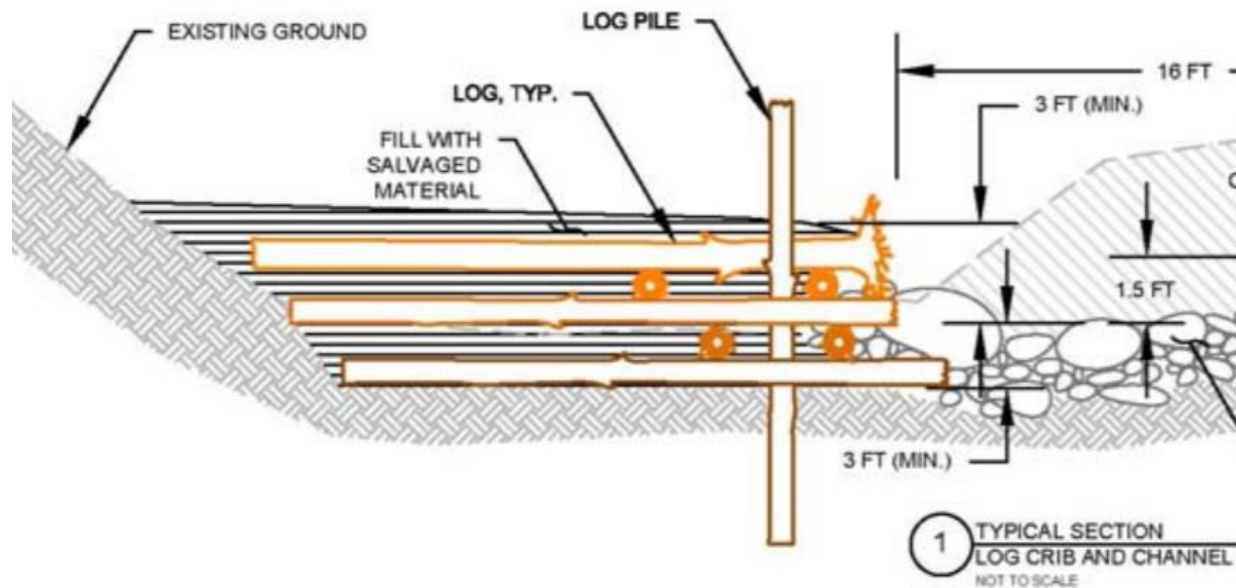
Typical section of a log crib wall design (Lee et al., 2015)
